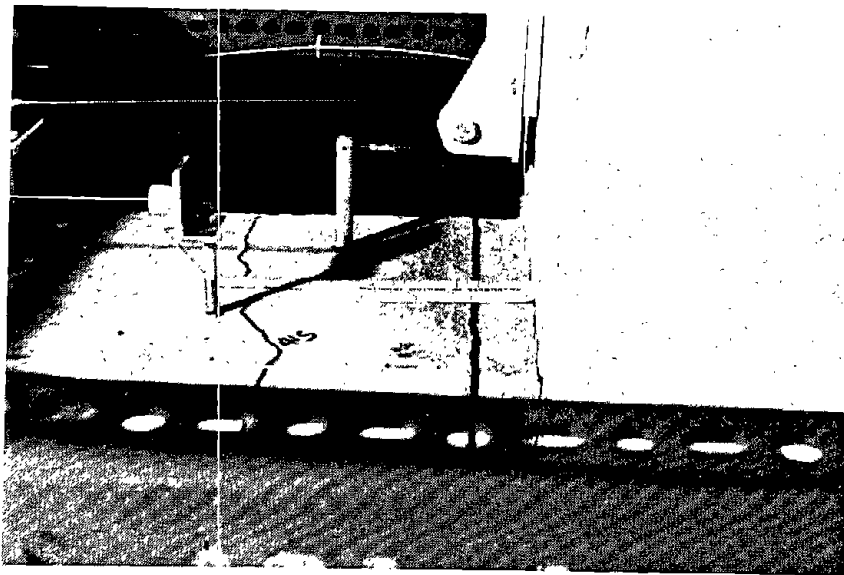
Opening between the beam and construction joint at $4 \Delta_y$.
